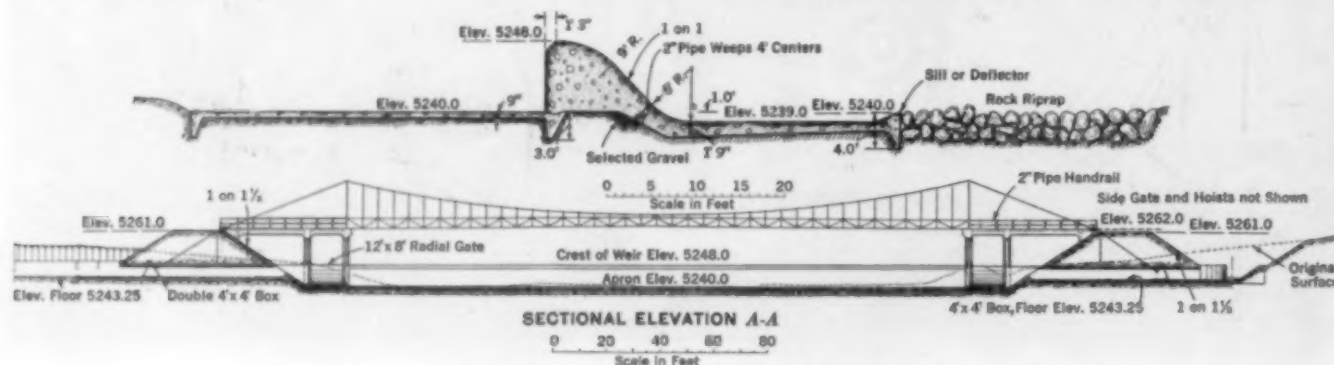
CROSS SECTION AND ELEVATION OF THE COCHITI DIVERSION DAM AS CONSTRUCTED IN 1932
